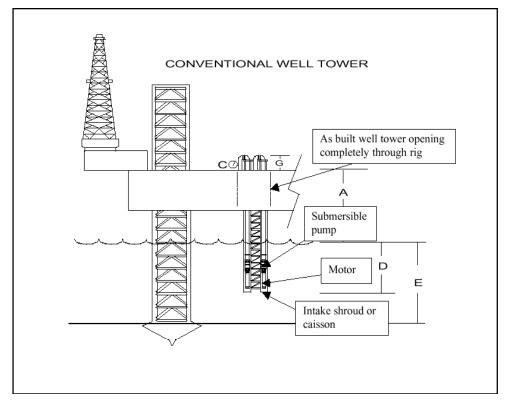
Offshore Caisson Cooling Water Intake Structure Design - Conventional Well Tower
